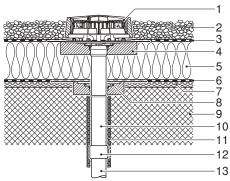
Installation in a solid roof insulated with roof foil and vapour barrier
